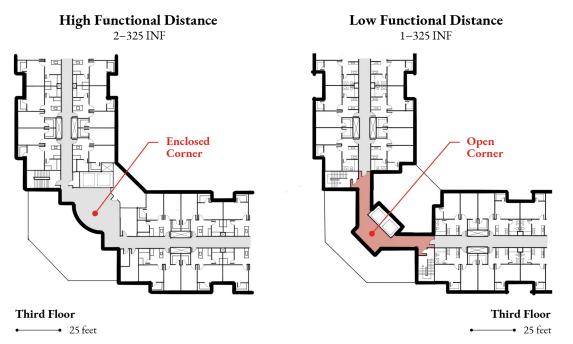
Floor plan comparison of 2-325 INF and 1-325 INF barracks at Fort Bragg. Graphic created by the author.
